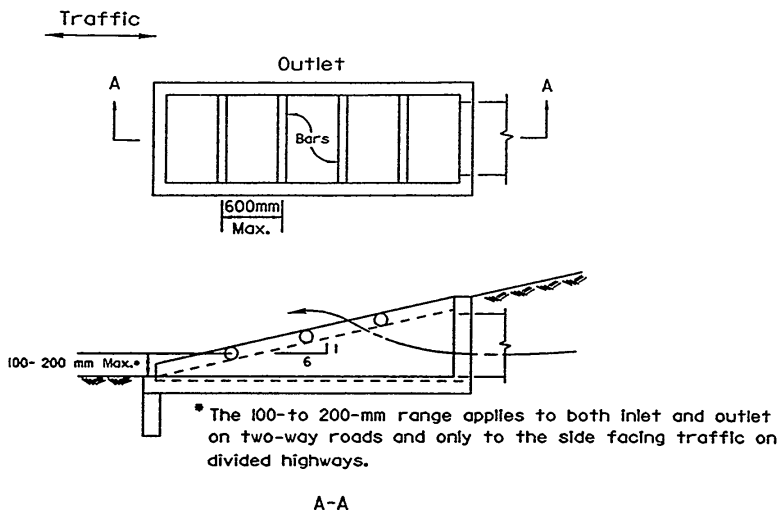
Inlet/Outlet Design Example for Parallel Drainage
